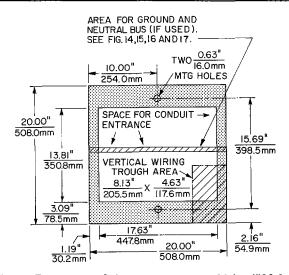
Bottom conduit entrance space 20-in. (508.0 mm) deep section
